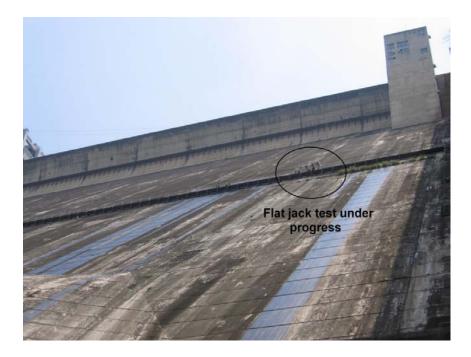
Location of Flat Jack test at D/S (R.H.S.) Face of Bhakra Dam.
